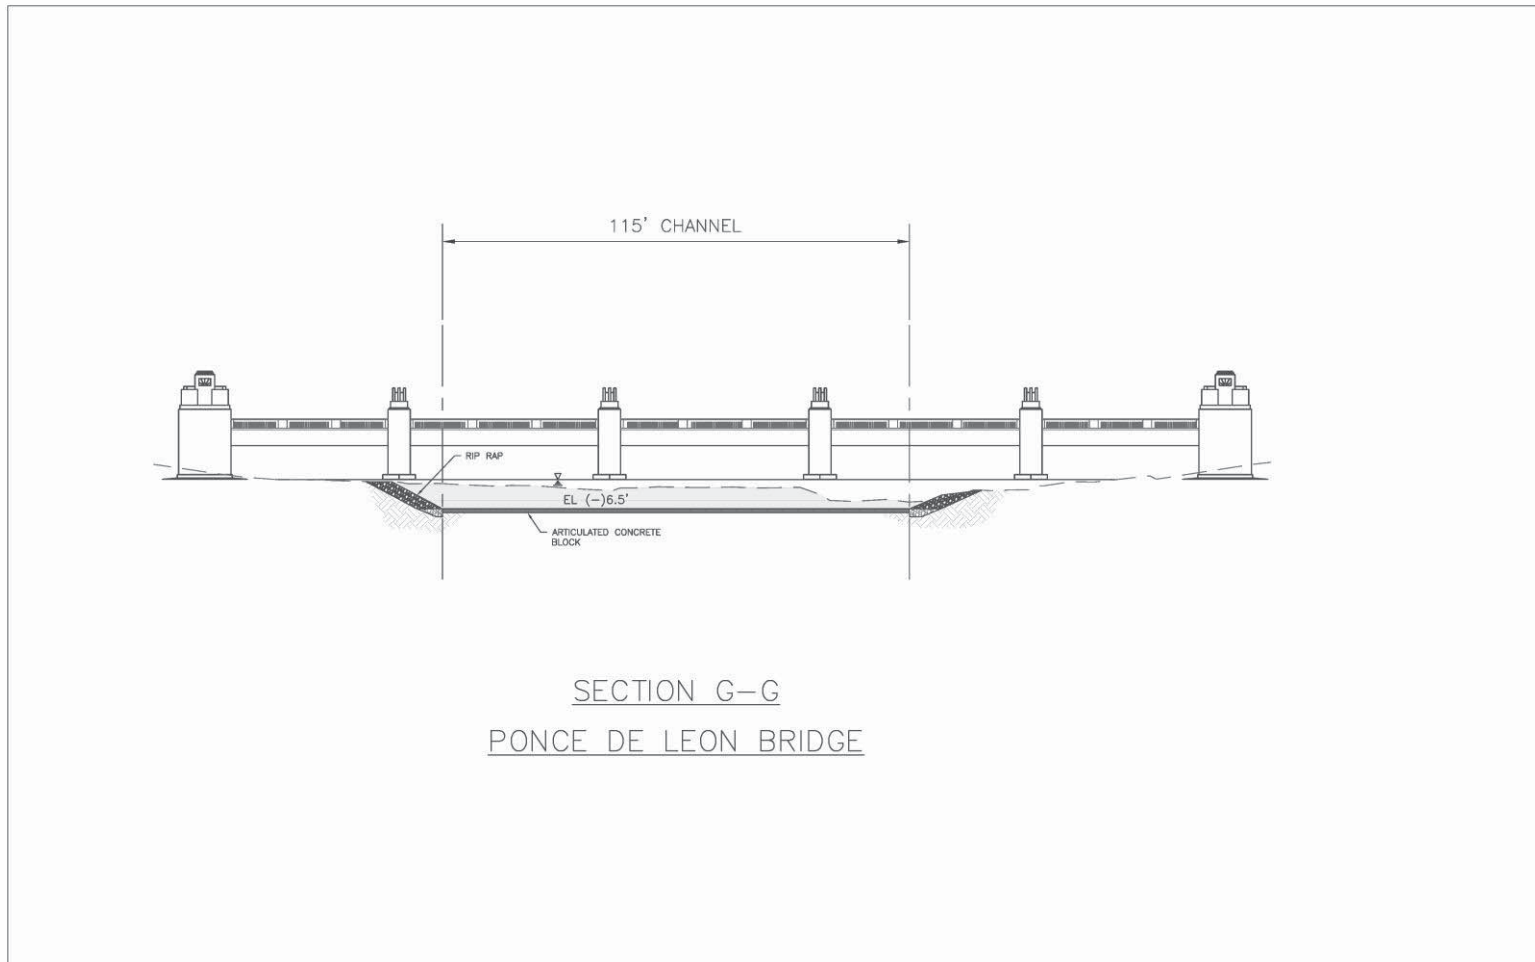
Cross Section G-G, Ponce de León Avenue Bridge
